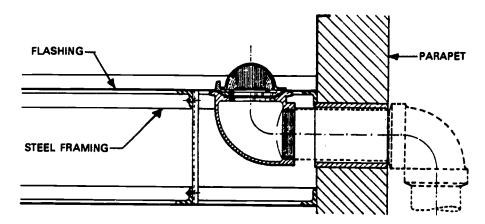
A series canopy drain installed in a metal deck with an outlet through a parapet wall
